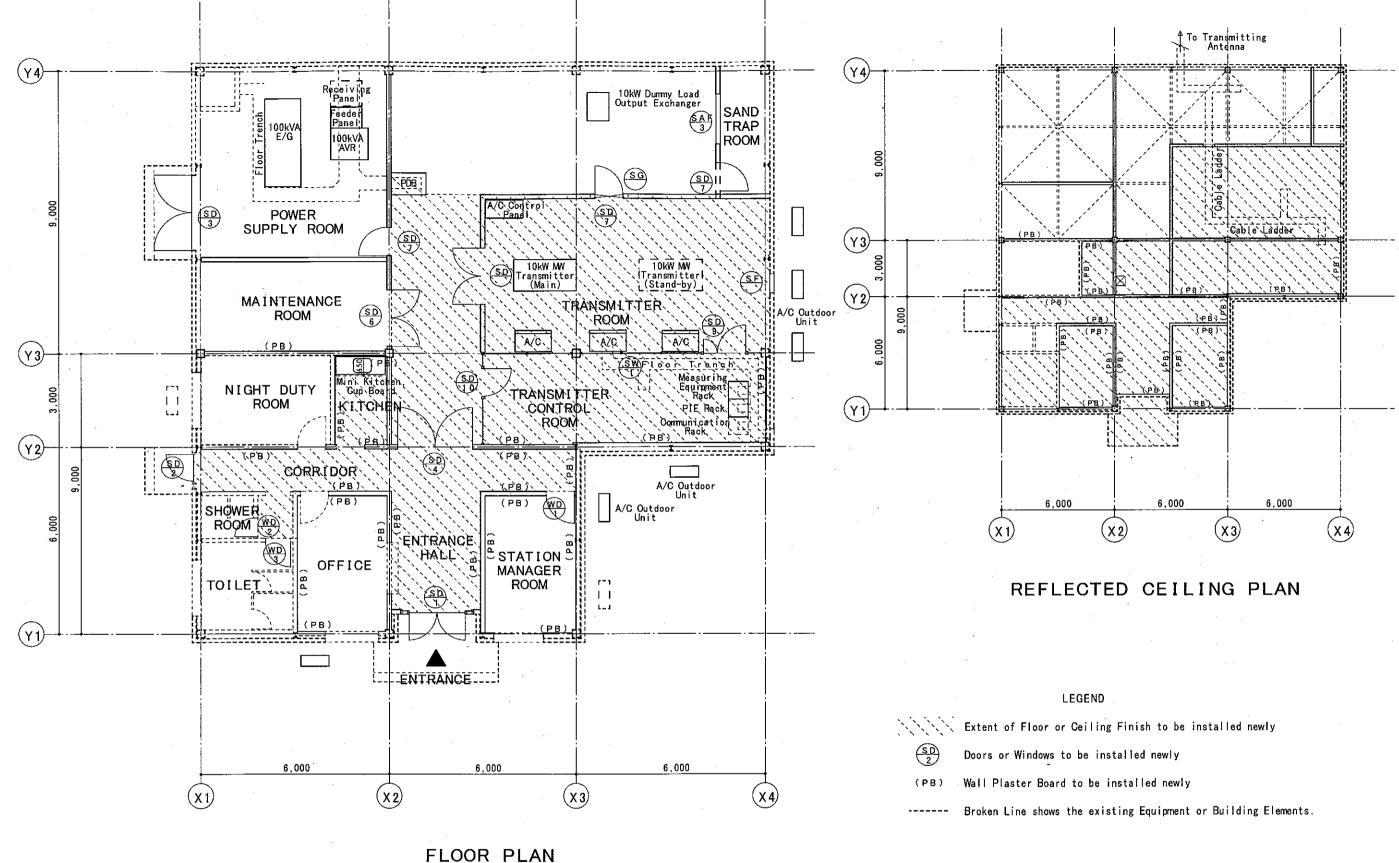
BARDIBAS 10kW MW TRANSMITTING STATION BUILDING RENOVATION PLAN (1)
